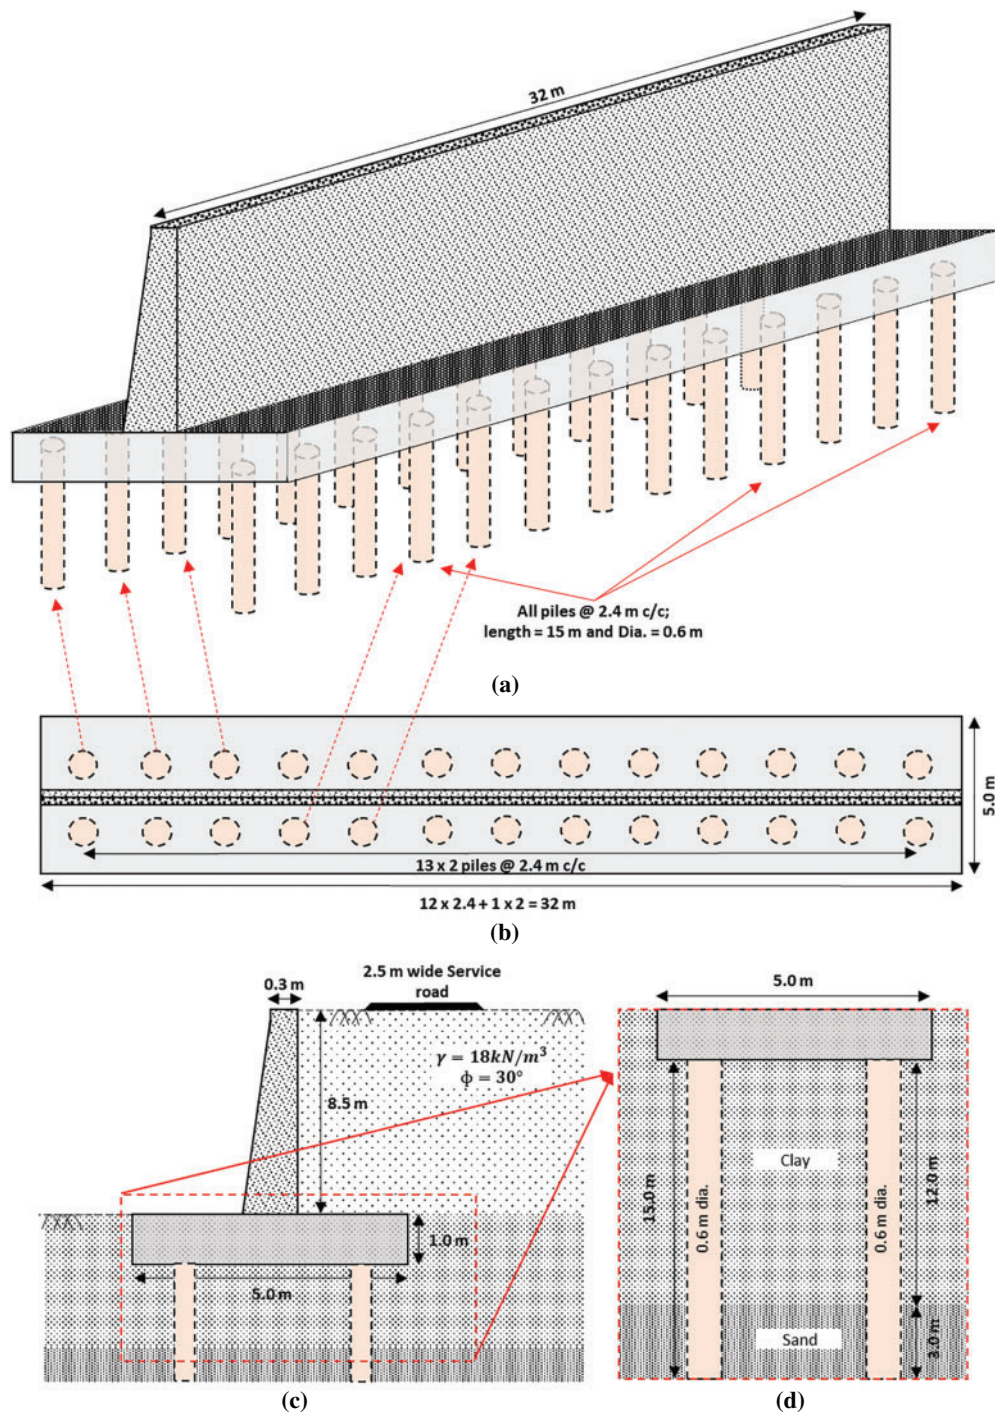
Schematic details of the proposed PRS: (a) Cantilever retaining wall with pile arrangement; (b) top view of PRS; and (c, d) sectional view of PRS
